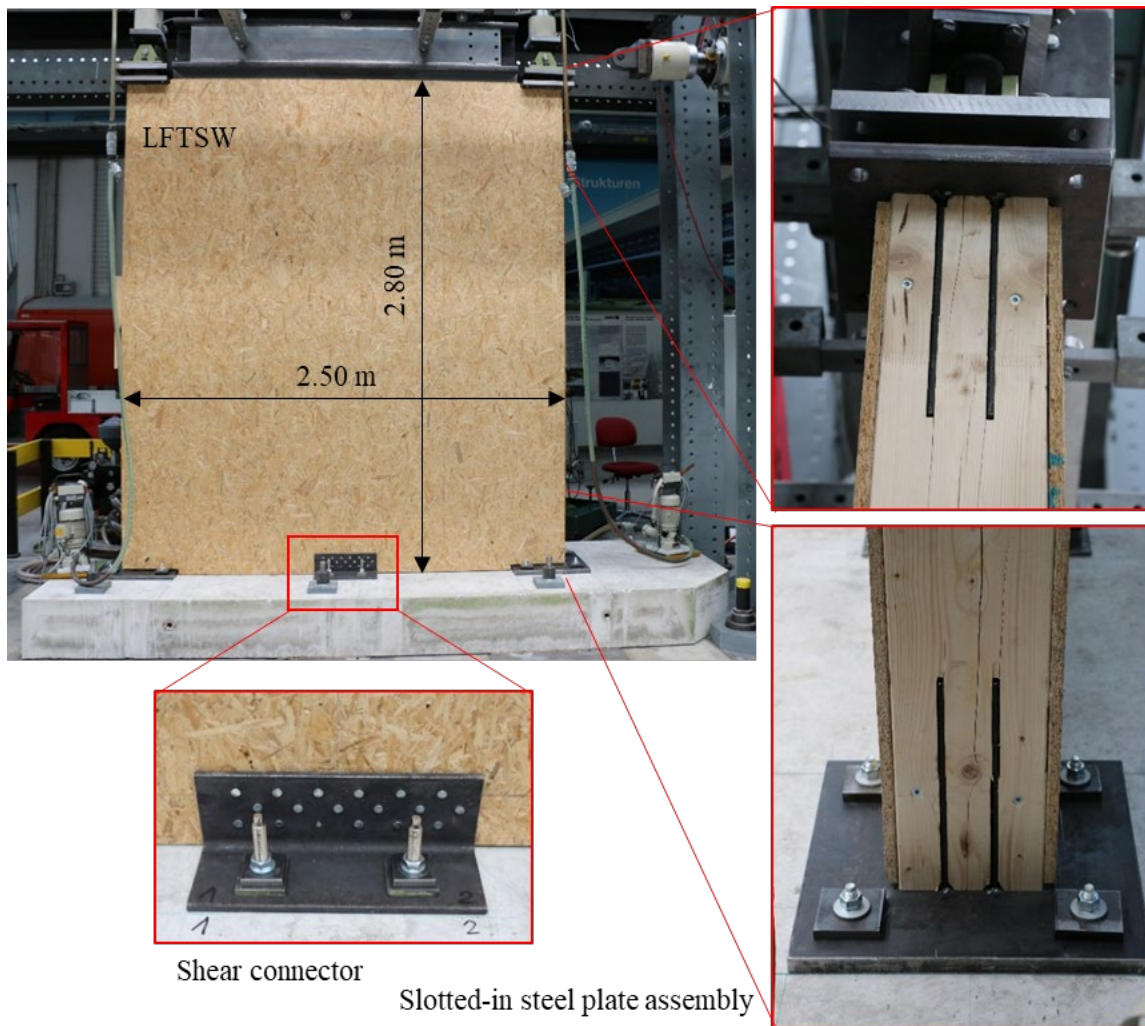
Sheathed timber frame shear wall (STFSW), L-shape shear connector, and slotted-in steel plate assemblies were used for anchoring the STFSW to the foundation.
